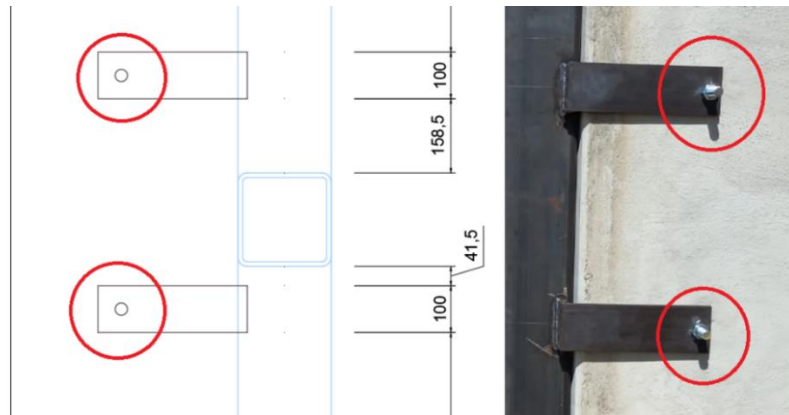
Threaded Bolts Connecting the Wall and the Steel Structure
